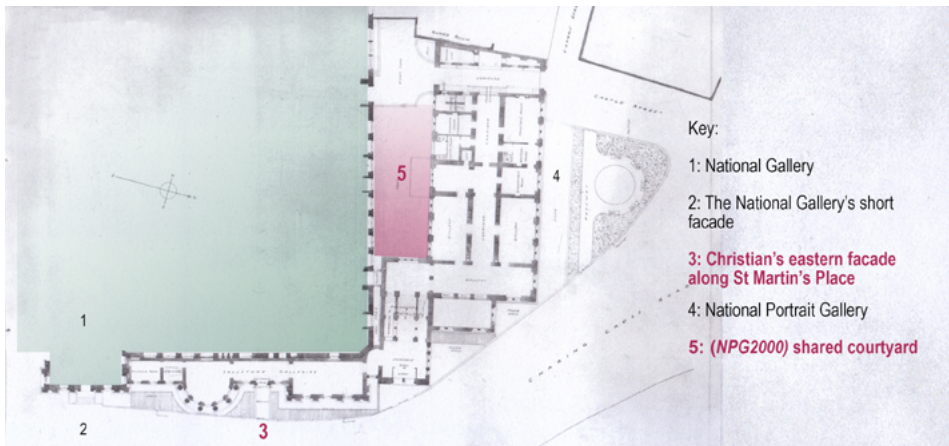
Site Layout Plan, National Portrait Gallery, c. 1900, London, Ewan Christian
